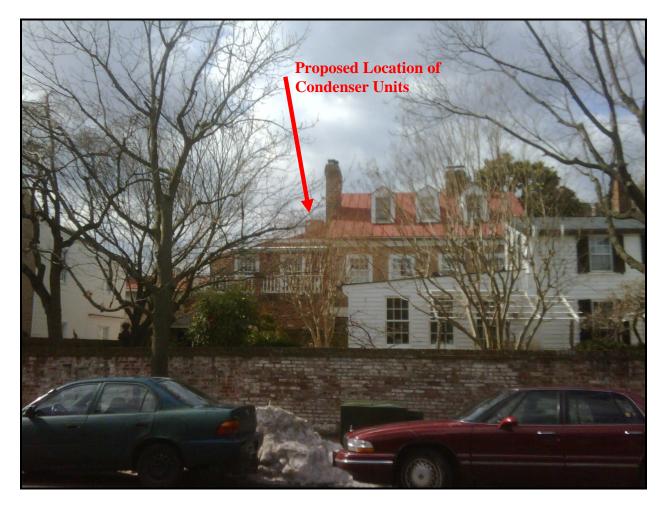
View of rooftop condenser mock-up from Lee Street ROW looking west
